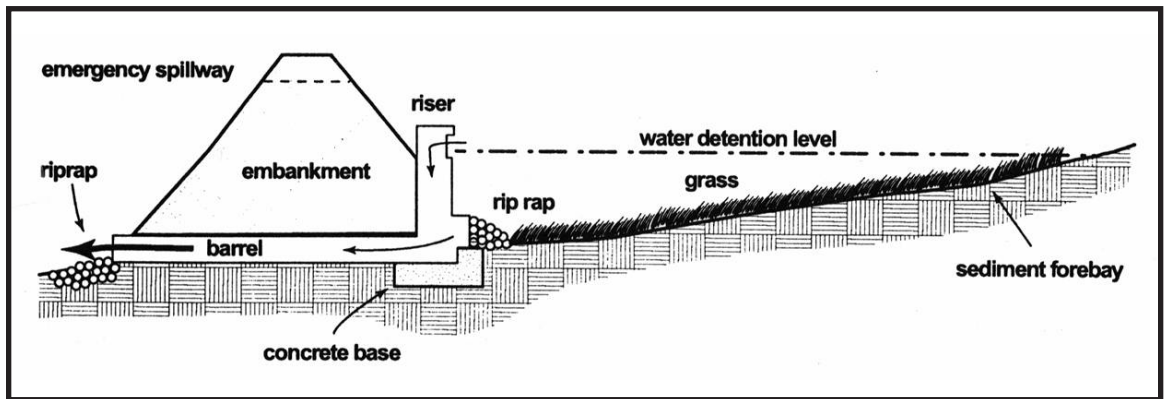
Example profile view of a dry pond design. Source: EPA Dry Detention Pond fact sheet.
